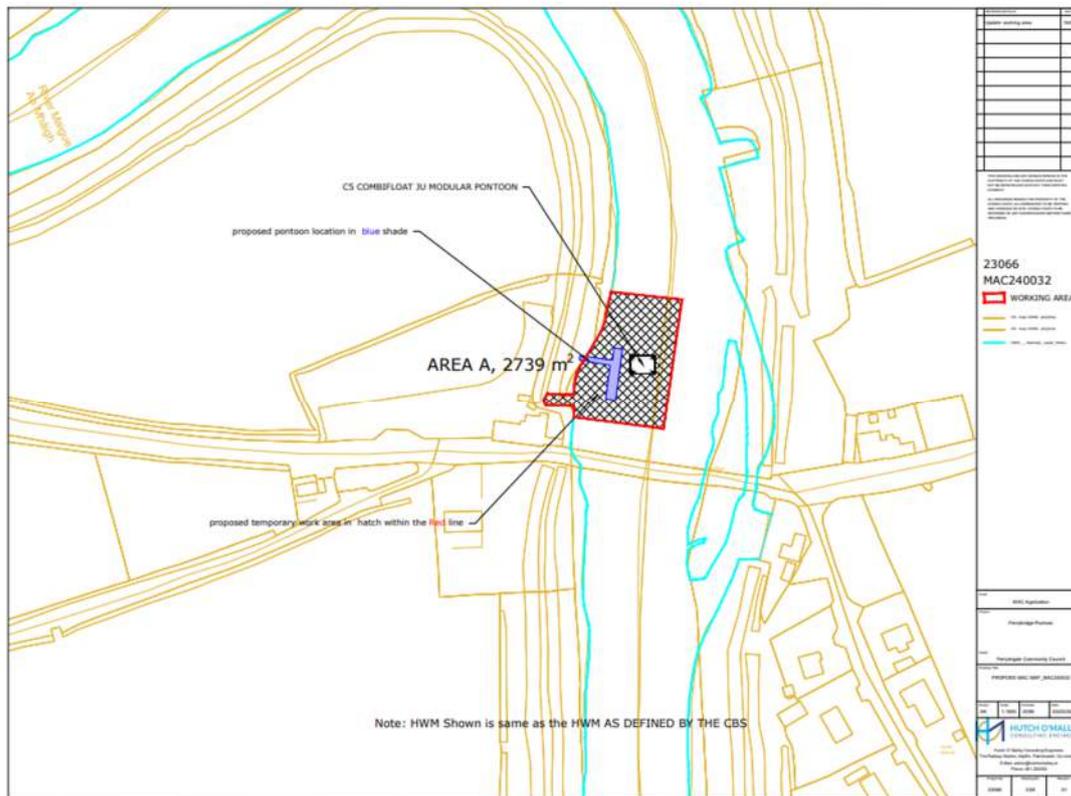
Applicant map of proposed layout of MAC area at Ferrybridge, County Limerick
